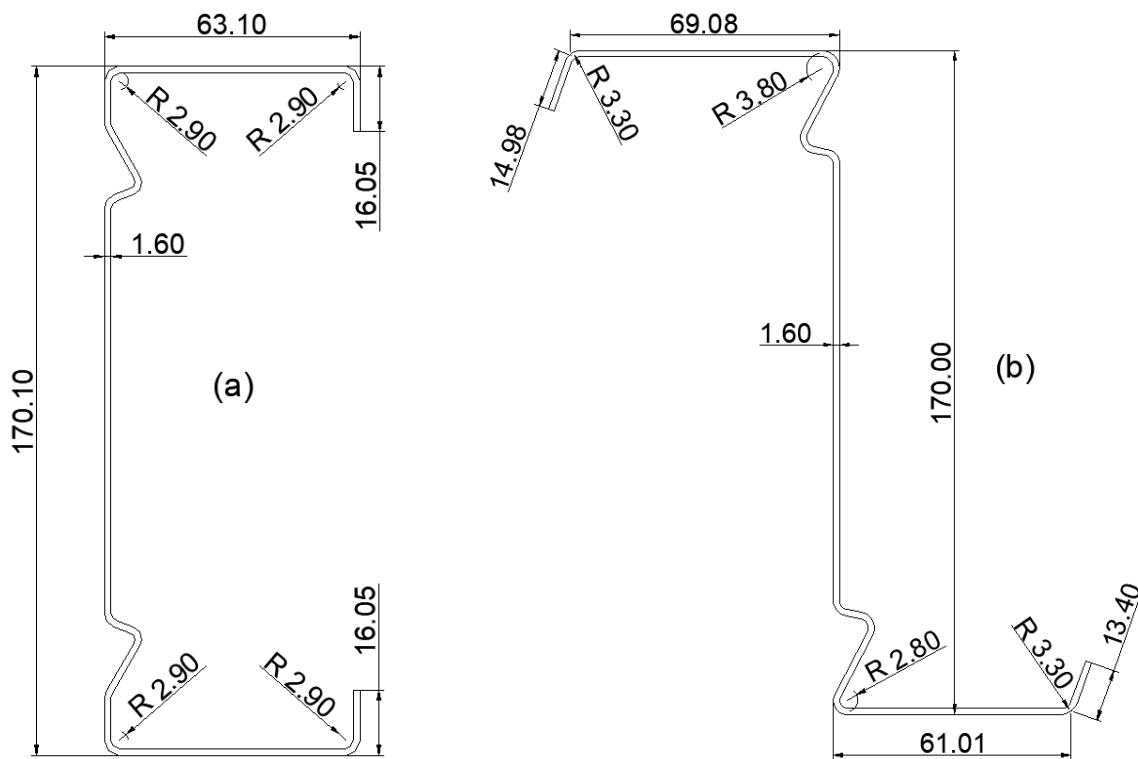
Cross section and dimensions (in mm) of the beam specimens used in experimental tests: (a) channel section, and (b) zed section.
